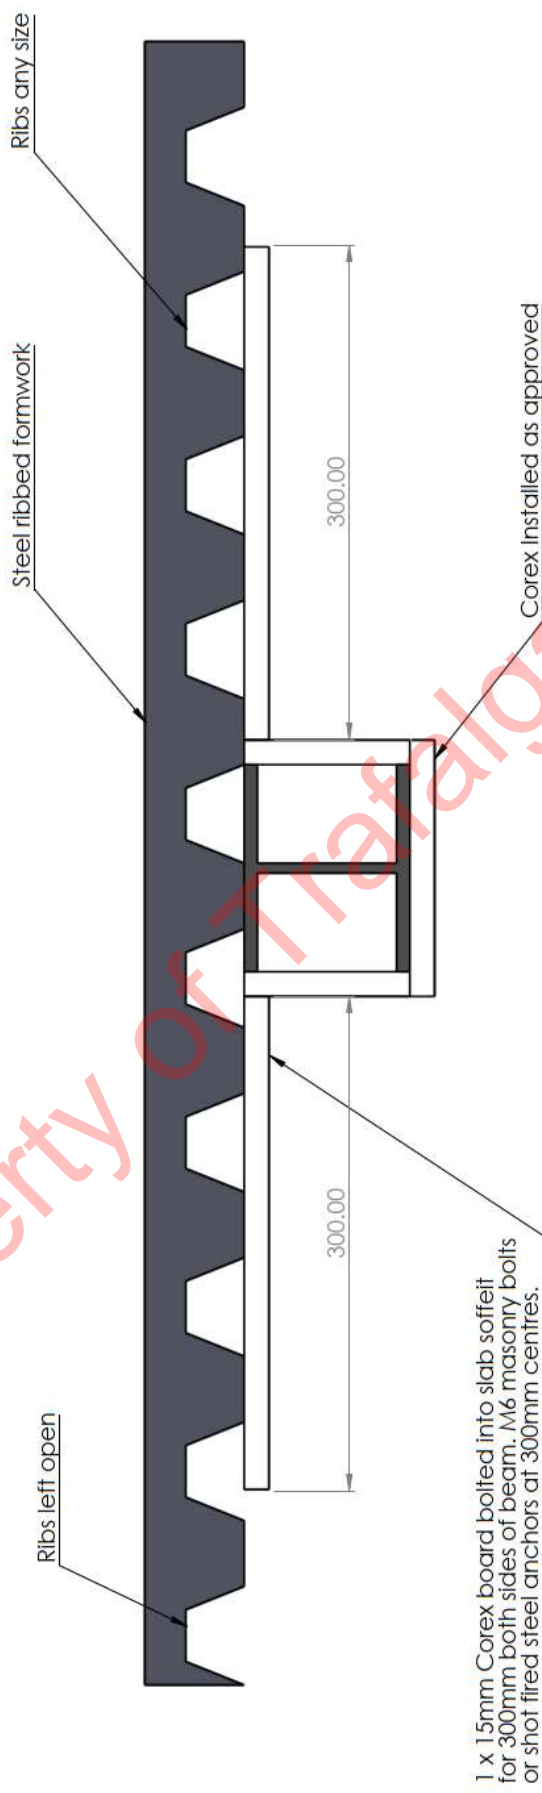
The construction detail of protected beam parallel to the voids of a composite floor slab with ribs of any size, with board protection extended for 300 mm on both sides
